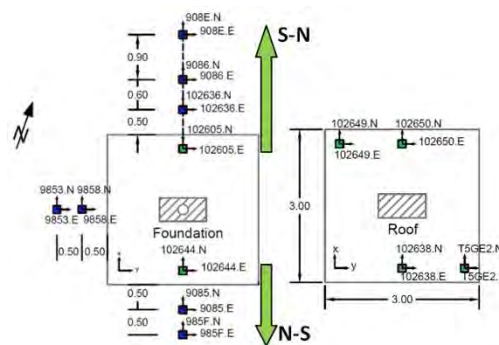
Instrumentation layout: analysis of the wave propagation from the roof to the foundation and from it to the soil surface in S-N (12650-102605-102636,908E) and N-S (102638-102644-9085,985F) directions
